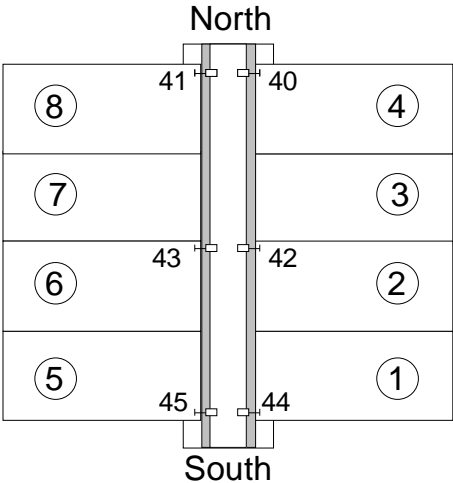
Transducers 40–45 measuring crack width on the top of the floor.
